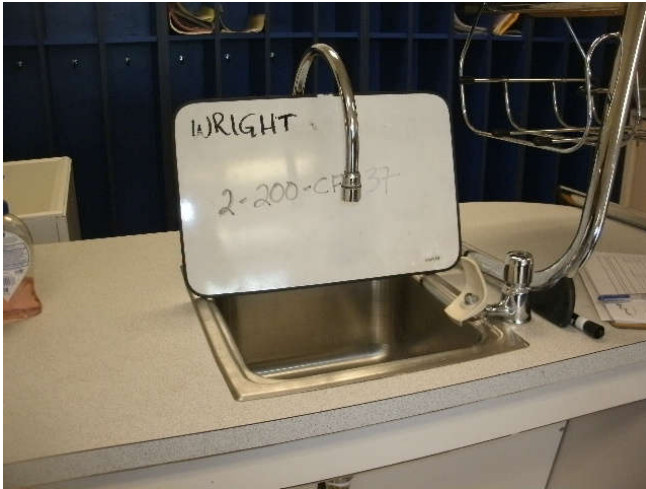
Classroom faucet w/bubbler, located on the 2nd floor, in room 200.
